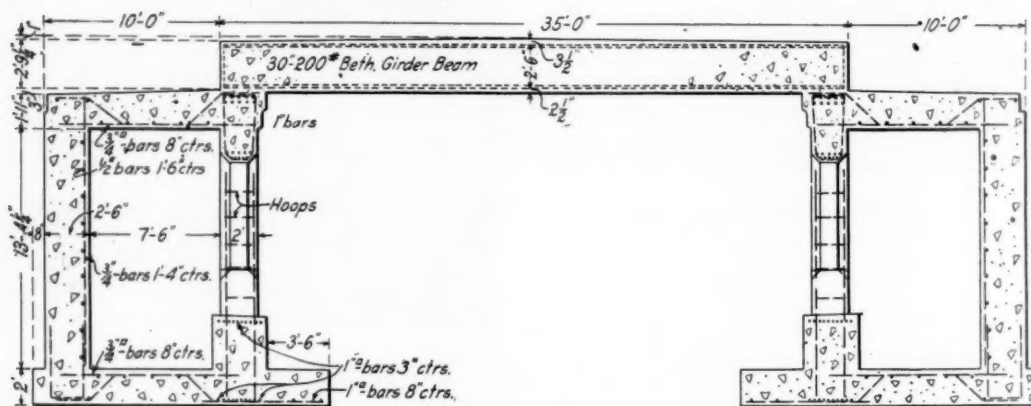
An Example of Box Abutment Construction Enclosing the Sidewalk Spans
